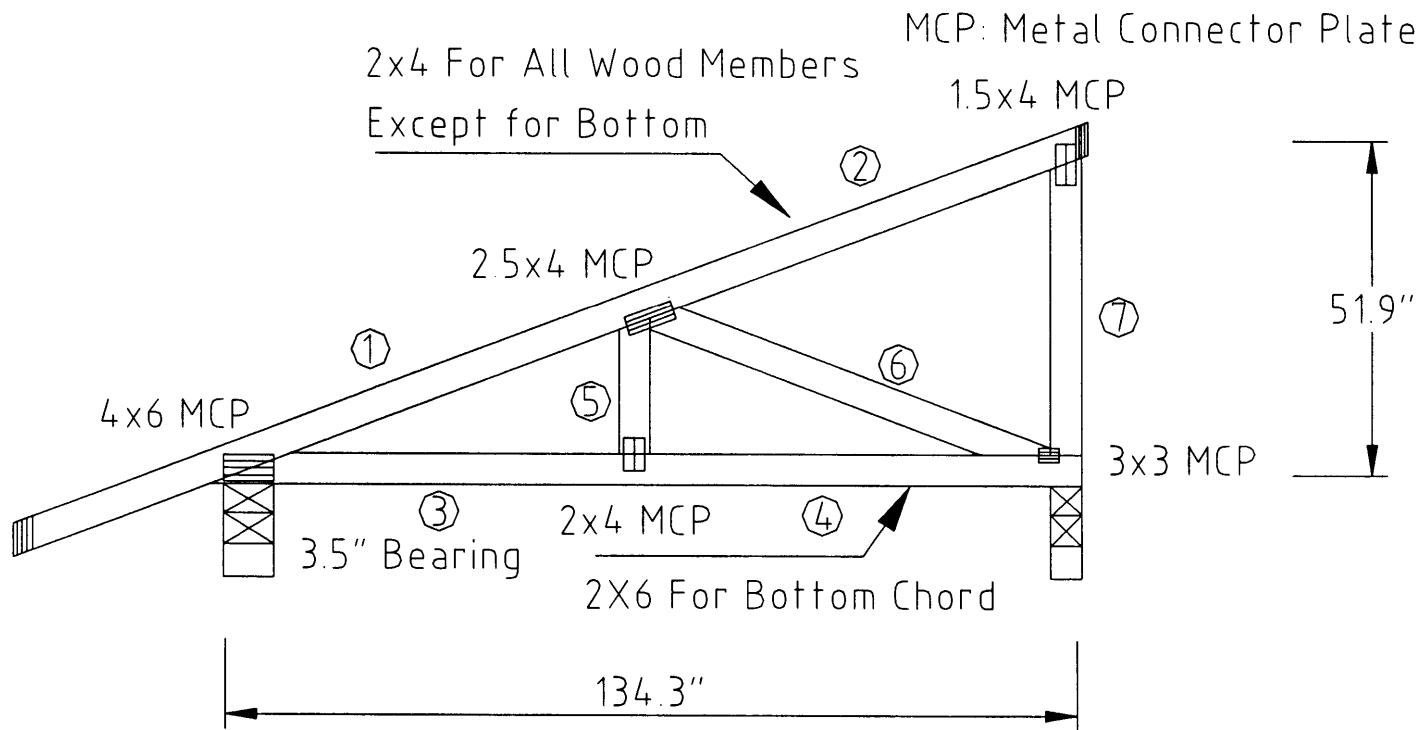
MPC Truss Type JGR from a Truss Plate Manufacturer
